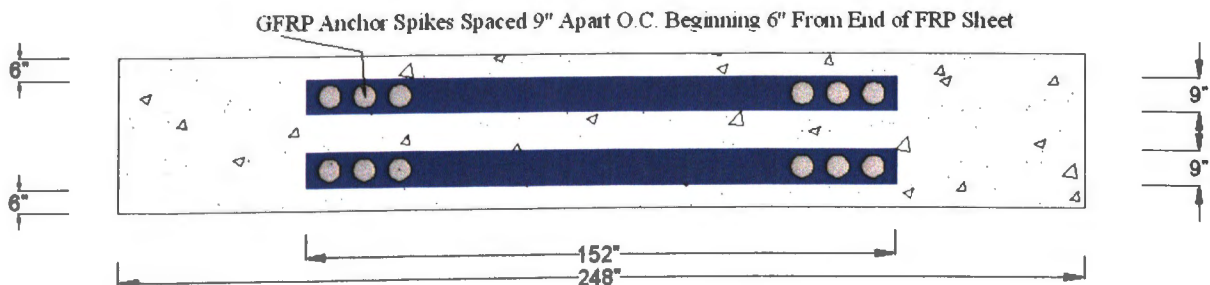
Installation Pattern for 90° Anchor Spikes Used in Piyong et al. (2003)
